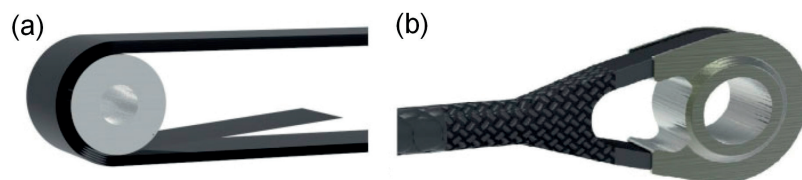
FRP strap anchorage: (a) non-laminated straps with inner free end; (b) laminated straps in wedge shape [19]
